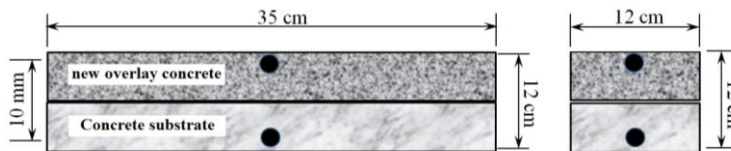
The shape and dimensions of the shrinkage test sample.
